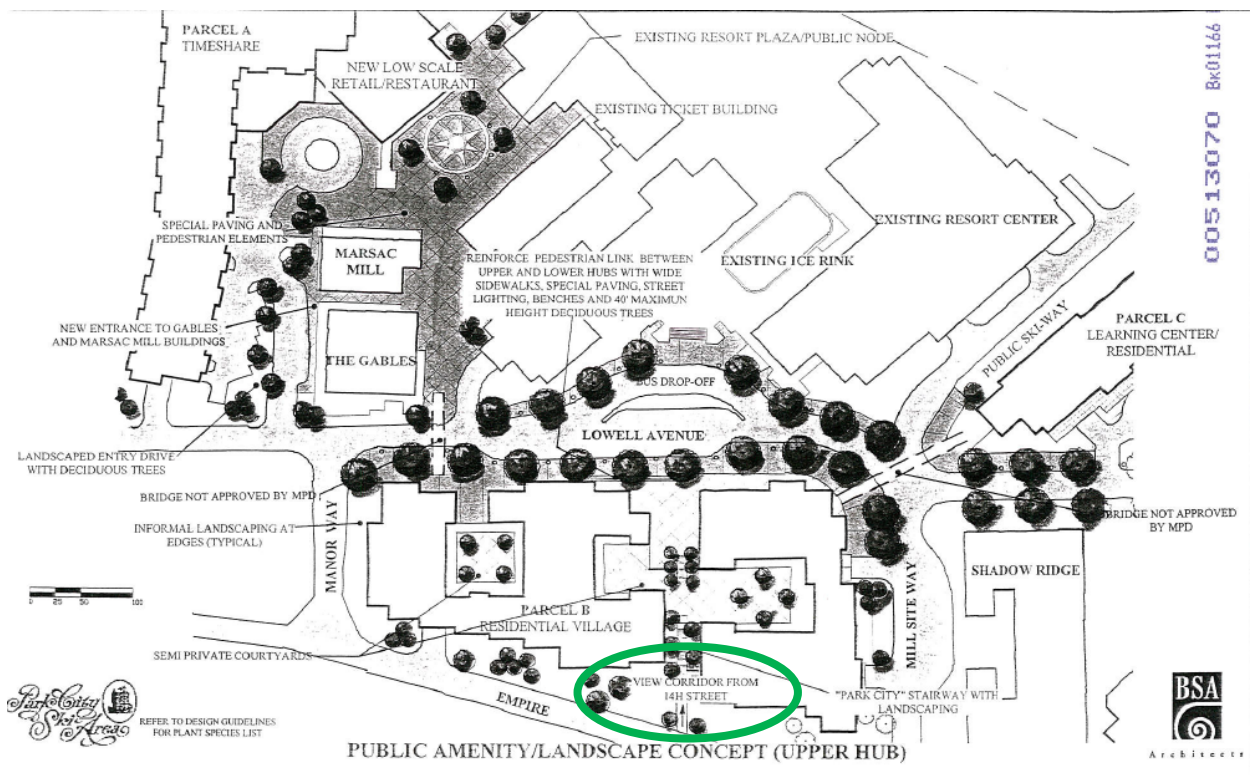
Note the View Corridor and Pedestrian Connection from 14th Street
